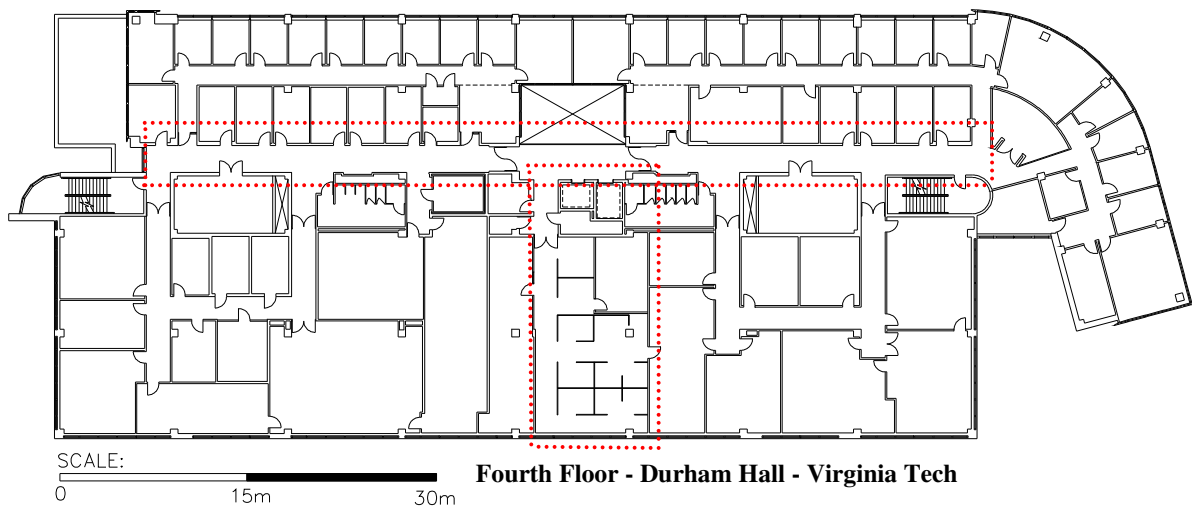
Floor plan of the fourth floor of Durham Hall with NLOS and LOS locations outlined
